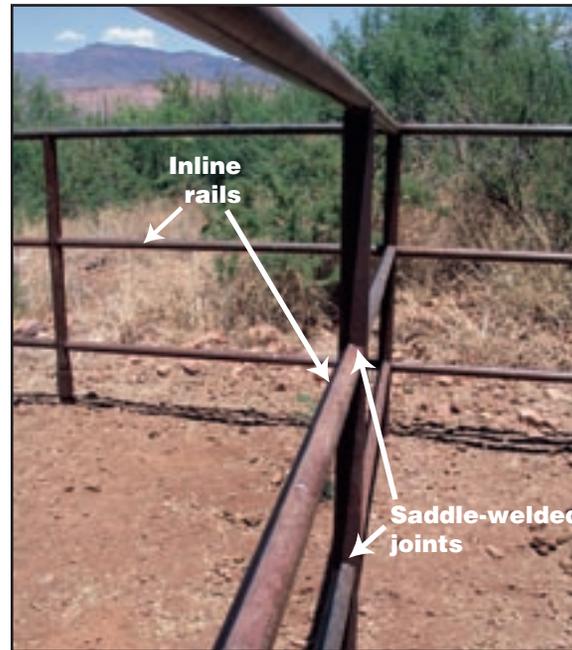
Welded inline rails generally are stronger than side-mounted rails. Saddle-welded joints are preferred.
